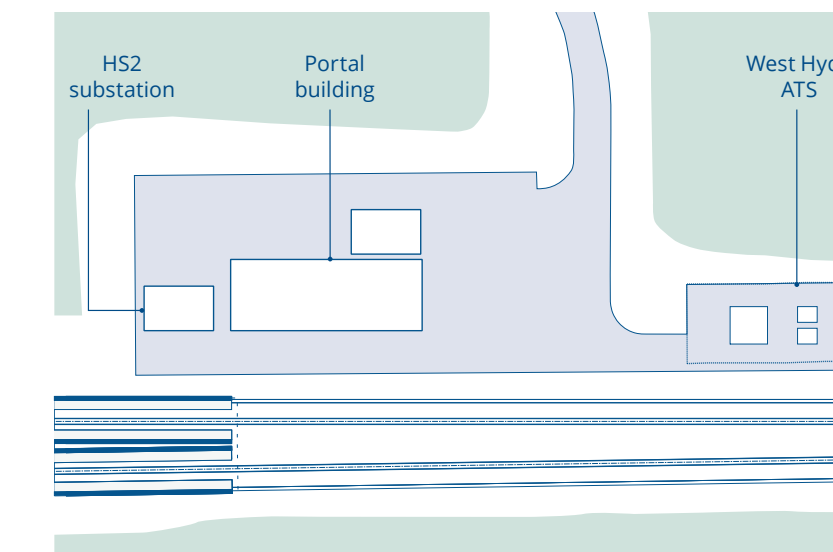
\_ Site Plan - Reference Design compound arrangement
